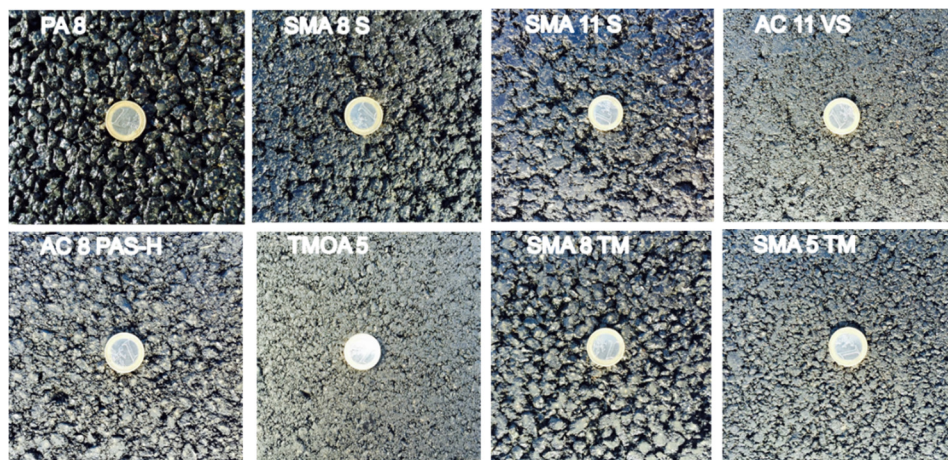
Road surface texture view of the Test Road of Low Noise Pavements sections
